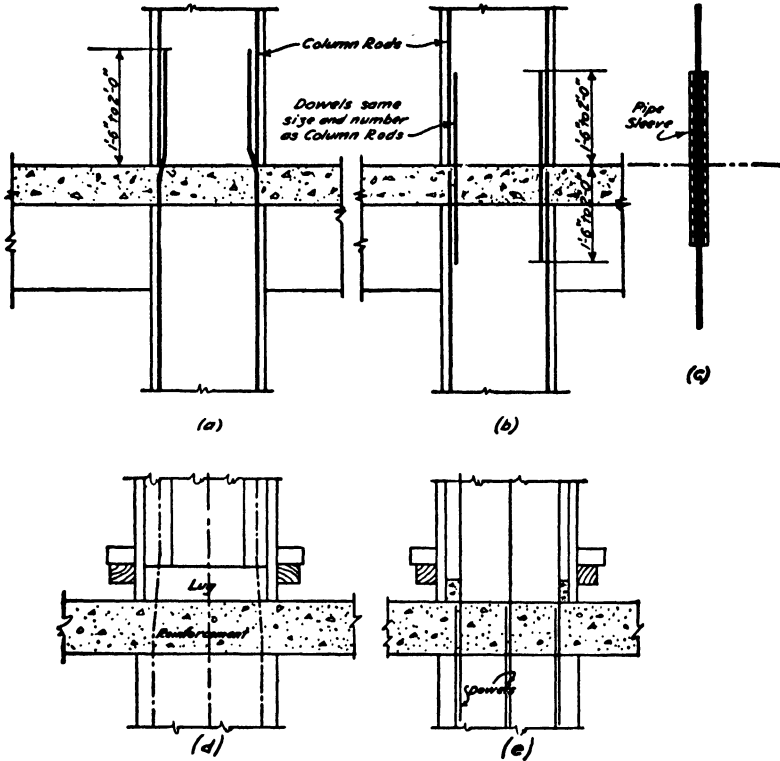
Reinforced Concrete Column Splices. (a) extended vertical steel and dowels; (b) separated dowels; (c) pipe-sleeve splices; (d)&(e) lugs for forms.
